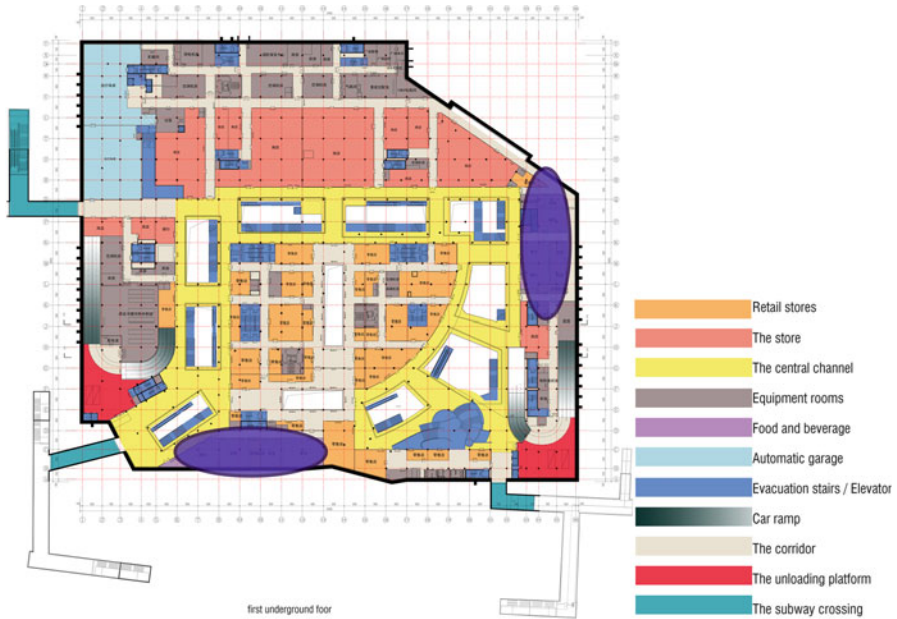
The kitchen and dining area on the underground floor of Wulin Square underground mall
